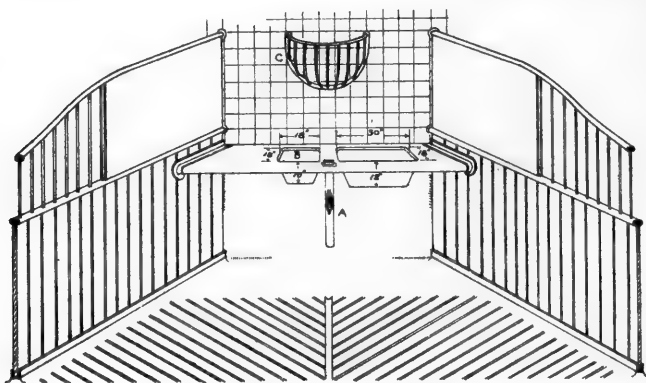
View of a stall with cast-iron manger fittings. A. Enclosed head-rope guide. B. Water pot close to manger, which is a bad feature. C. An overhead hay-rack which always should be condemned.
